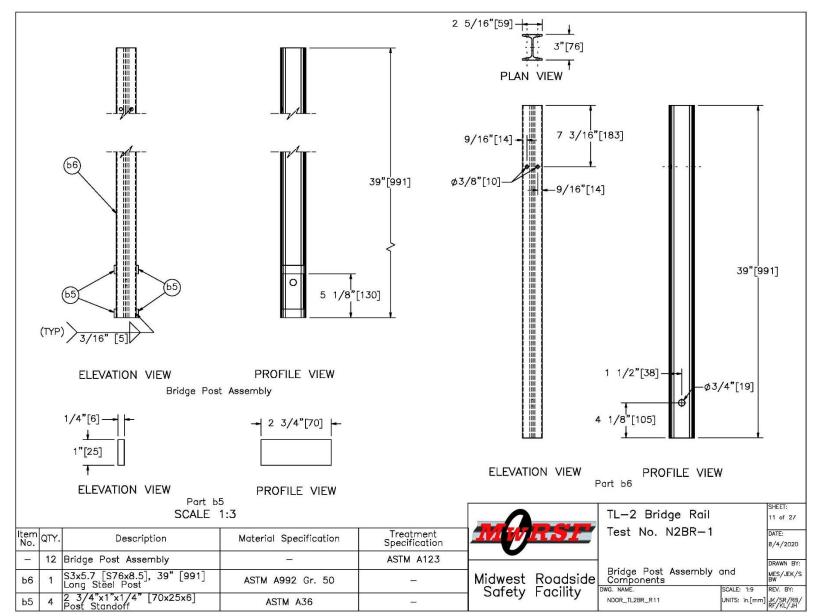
Bridge Post Assembly and Components, Test No. N2BR-1
